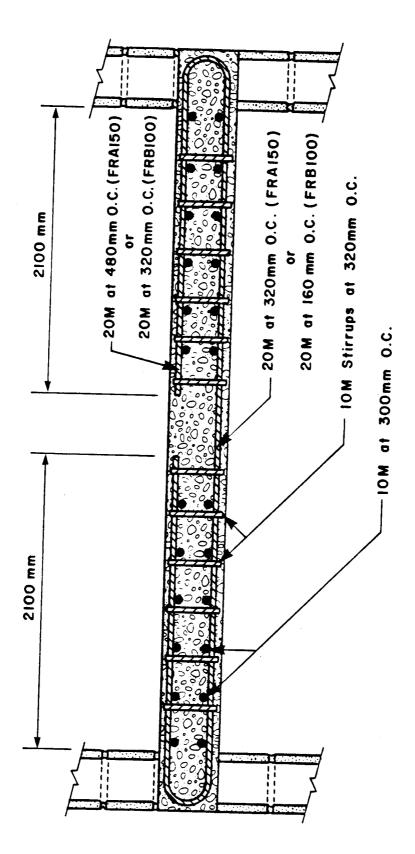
Slab Reinforcement Details for Type II Specimens
